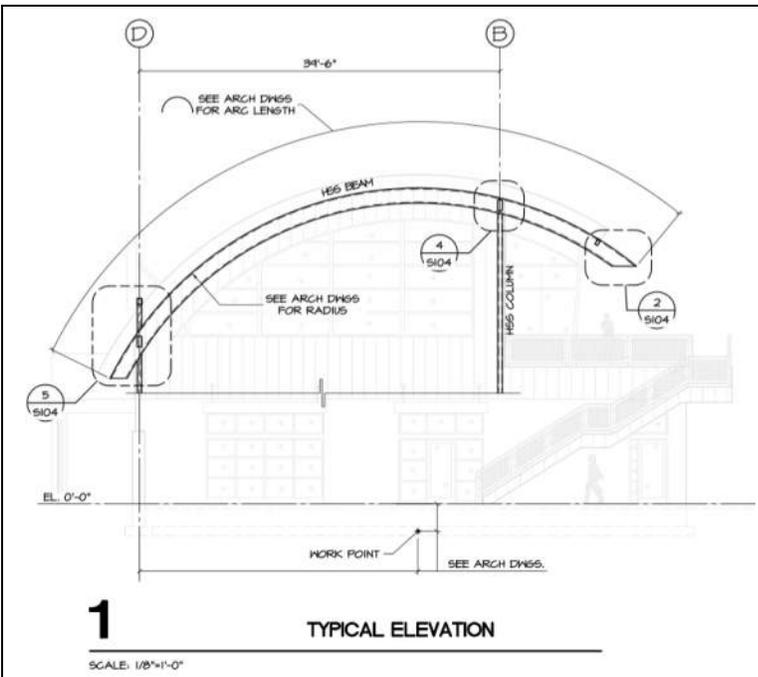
Exhibit G (Left): Cross-section showing the curved HSS beam and spacing of two HSS columns supporting both cantilevered eaves.
